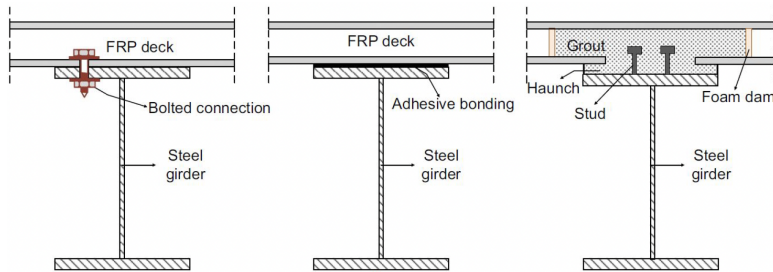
System-level connection types in steel-GFRP bridges [58].
